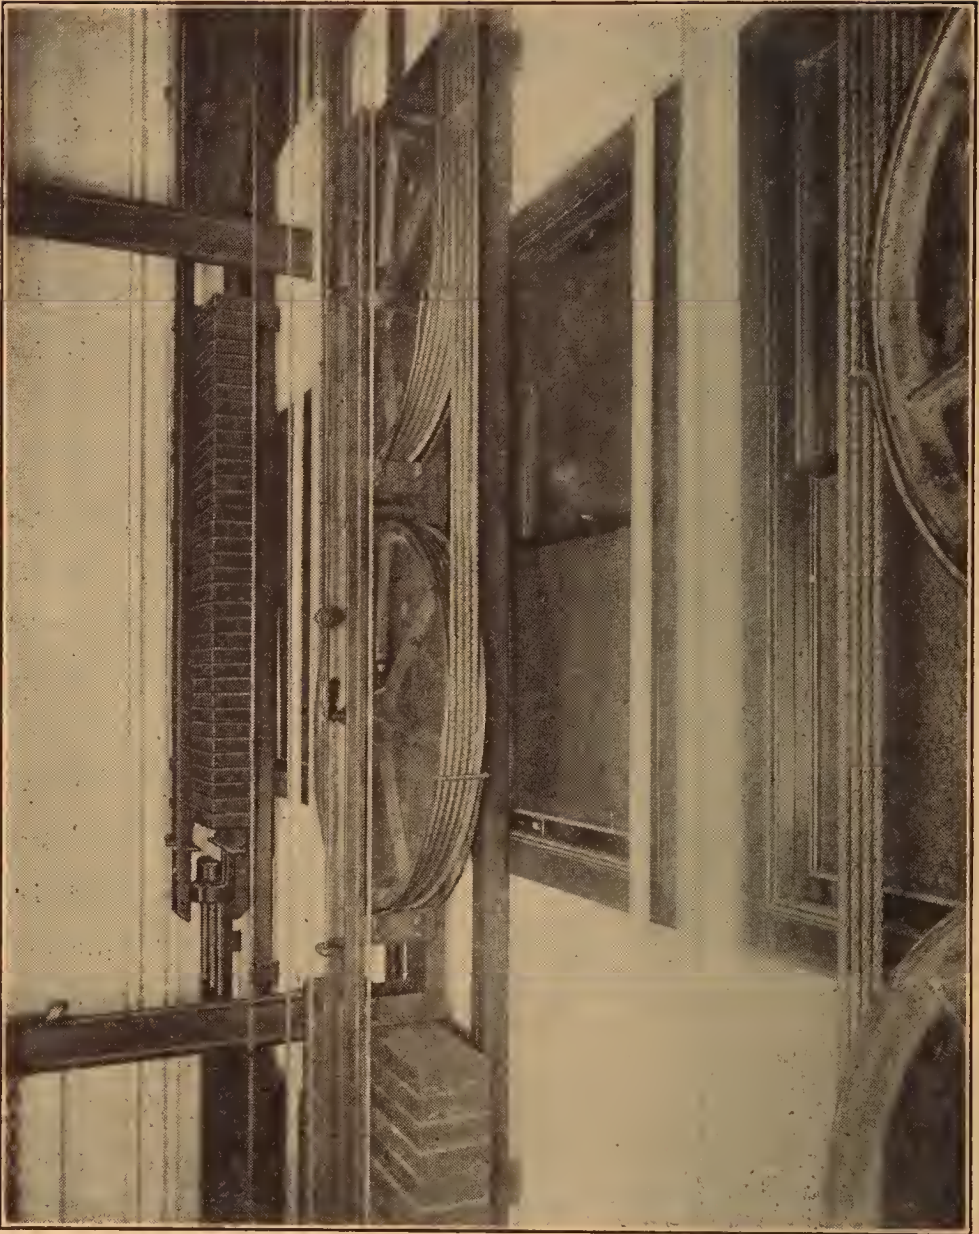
A VERTICAL HYDRAULIC EQUIPMENT, PROPERLY INSTALLED.
